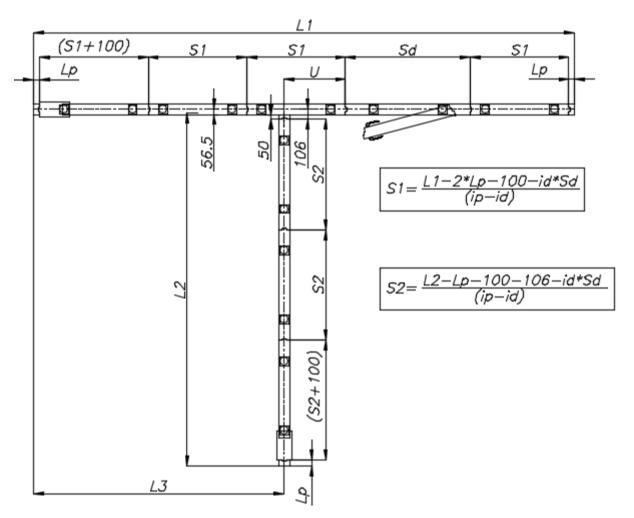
Calculations for a T-shaped wall L1 and L2-length of both walls Lp-skirting boards Spt1 and Spt2-telescopic panels L3-distance of wall axis L2 from the id-number of door panels wall
